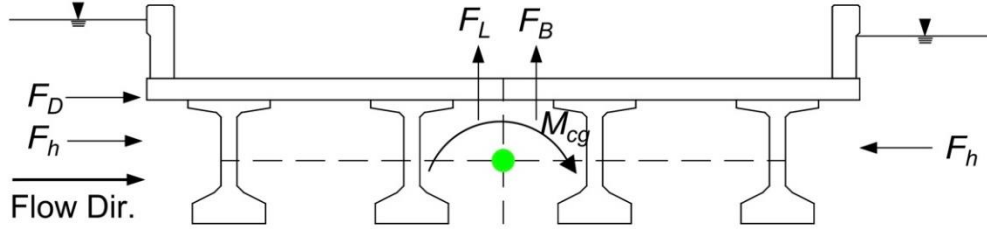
Schematic of forces and overturning moment exerted by flood on a stream-crossing bridge superstructure
